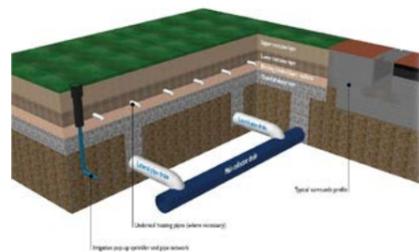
Conventional sand-over-gravel suspended water table pitch design with automatic pop-up irrigation system.
